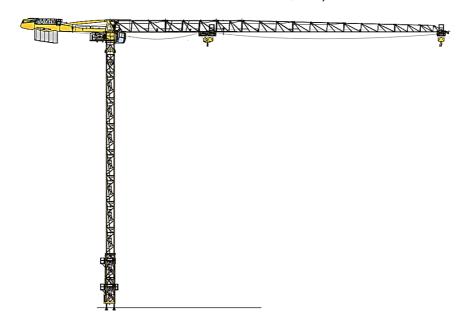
Topless hammerhead tower crane (www.nftcrane.com)
